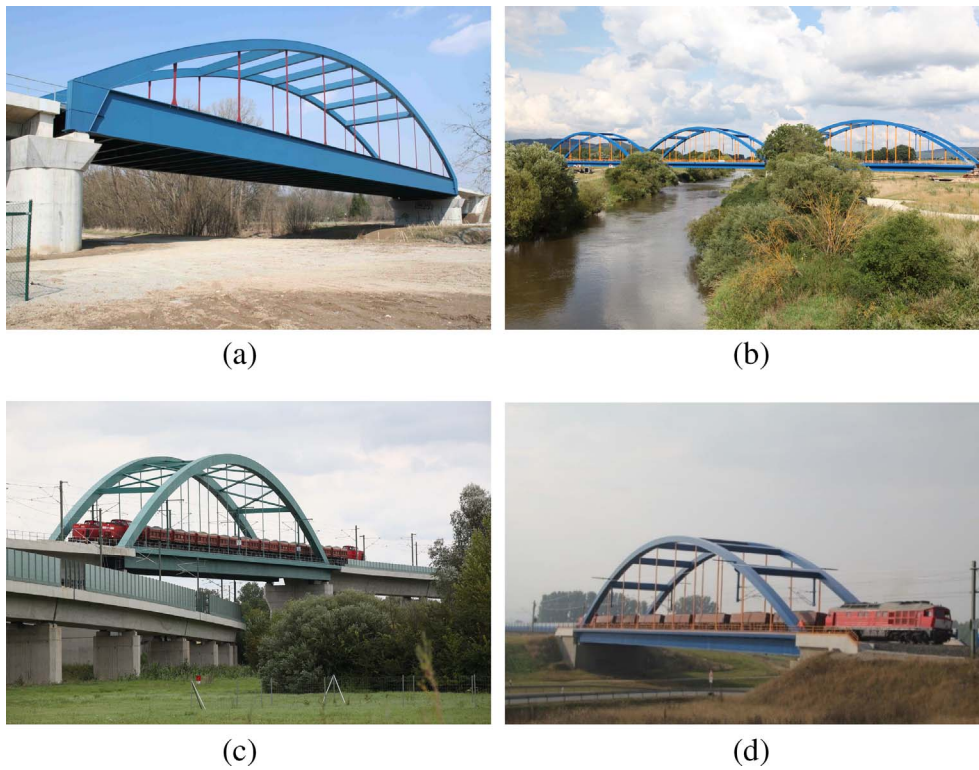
Tied-arch bridges with box-sections arches on German HSR lines (a) Gera Viaduct at Bischleben (Photo: Störfix), (b) Main bridge Wiesen (Photo: Störfix), (c) Saale-Elster Viaduct (Photo: Claus Rudolf) and (d) Flutmulden Bridge at Wiesen (Photo:DB AG/ Hannes Frank).
